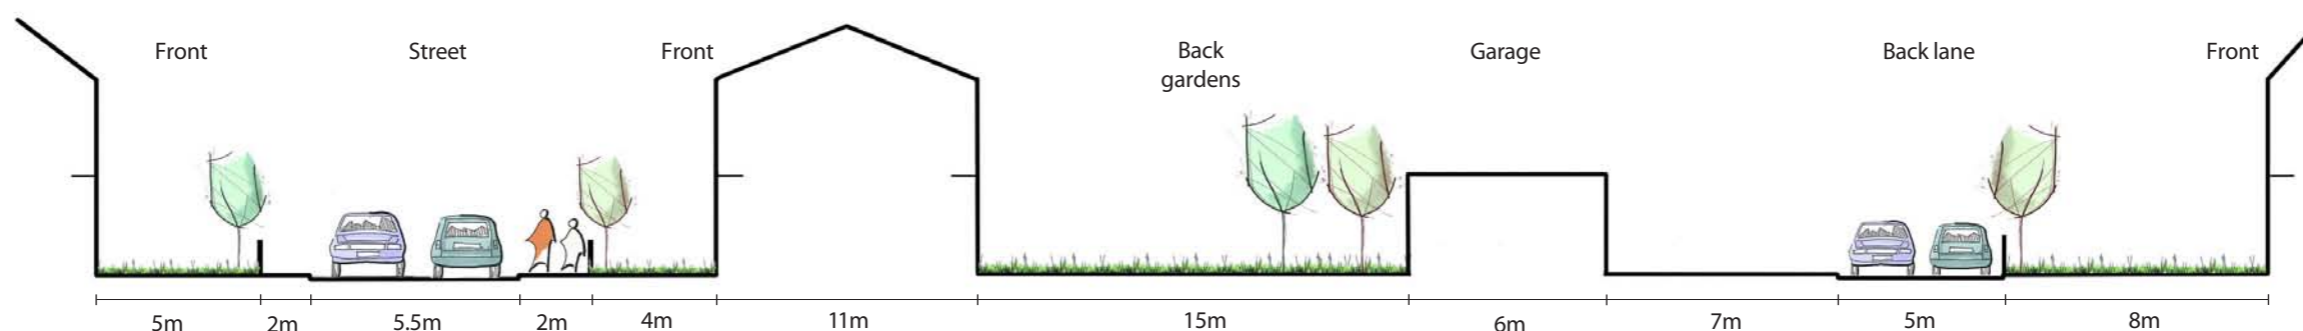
Section A cuts through the block and demonstrates the typology of on-street parking in the front with vehicular access through a lane, into garages located to the rear. Adjoining the garages is a row of front gardens providing a degree of surveillance onto the lane but locating fronts onto backs
